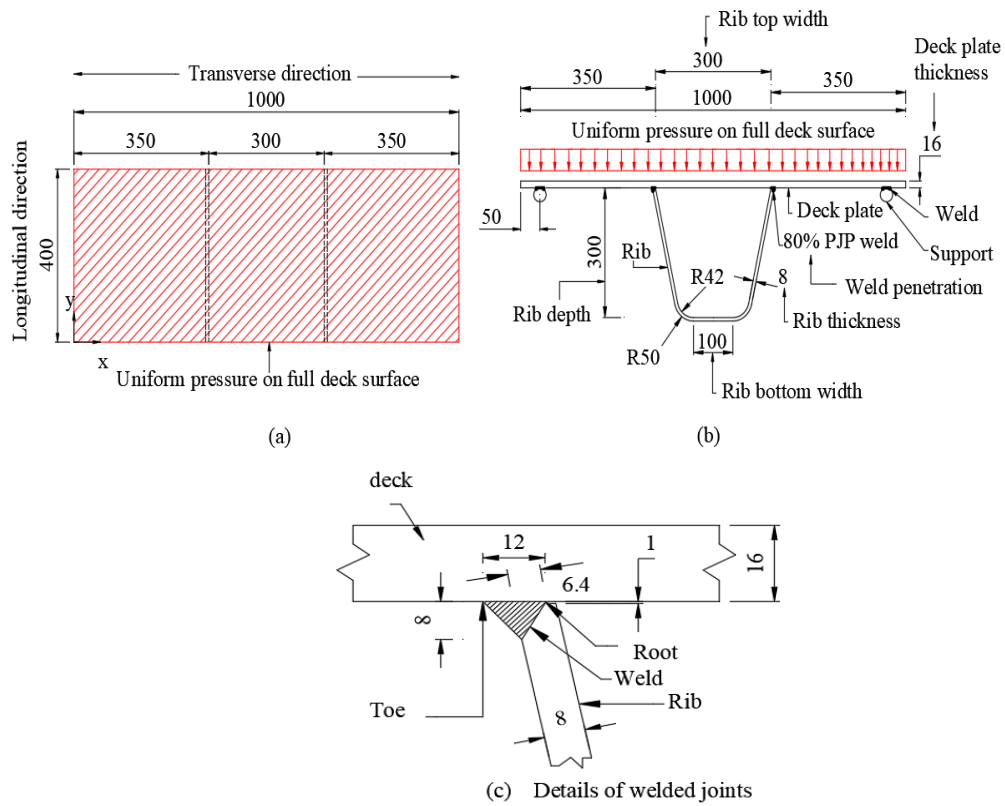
Dimensional details, loading condition of U-shaped rib and weld dimension
